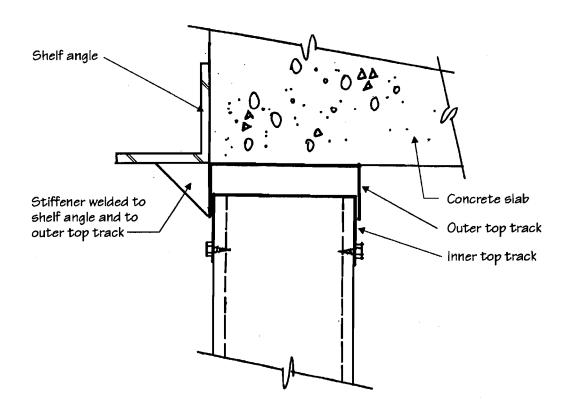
21 OUTER TOP TRACK WELDED STIFFENER RETROFIT DETAIL
